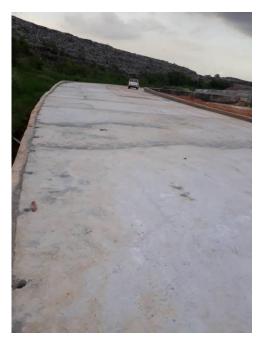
Newly constructed 945sq meter reinforced concrete ramps at Oti
